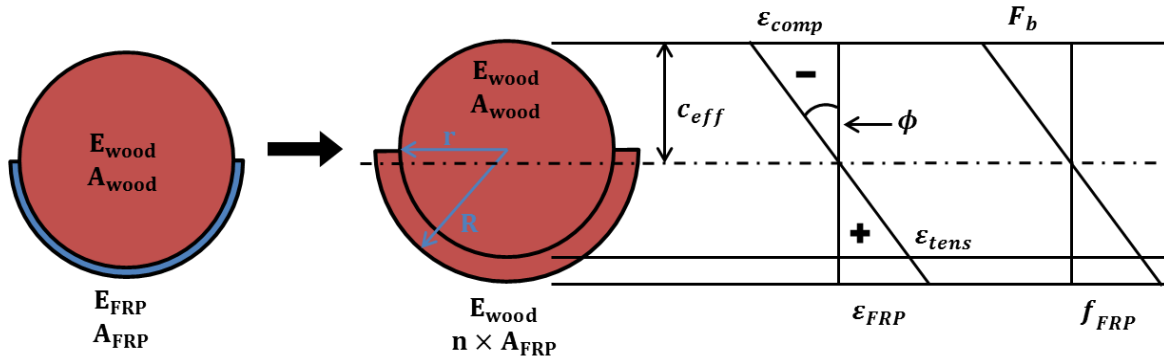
Elastic design approach for abutment pile FRP retrofit design.
